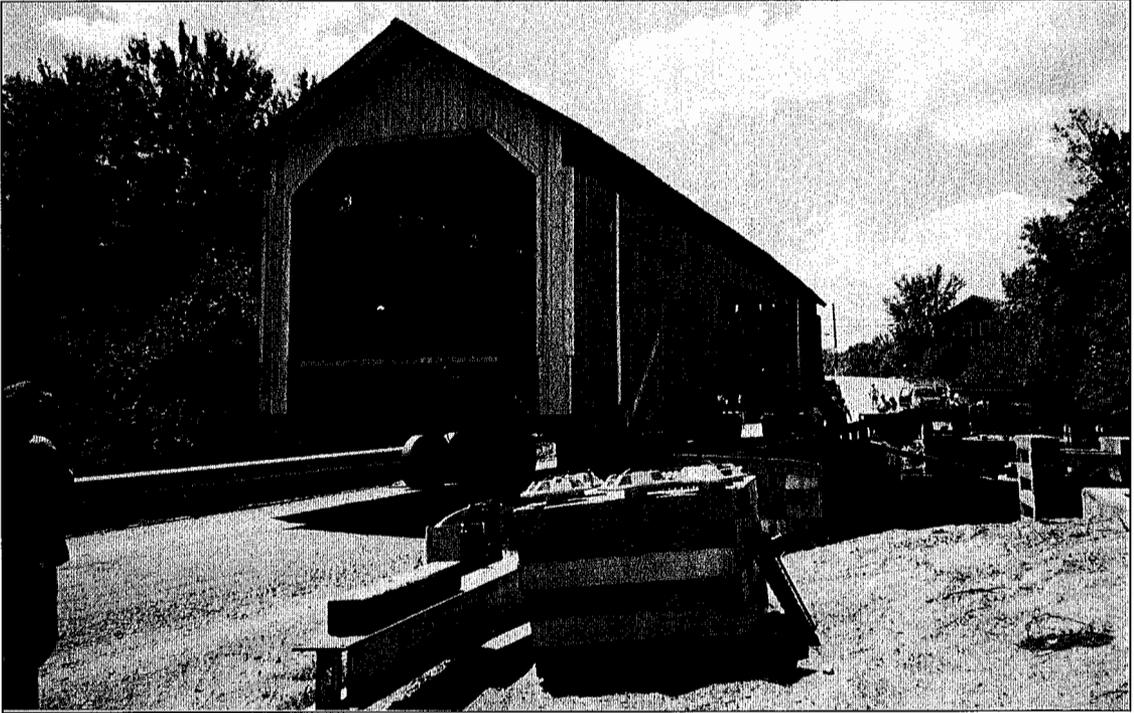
Atop the bypass bridge and ready to be slid sideways.
